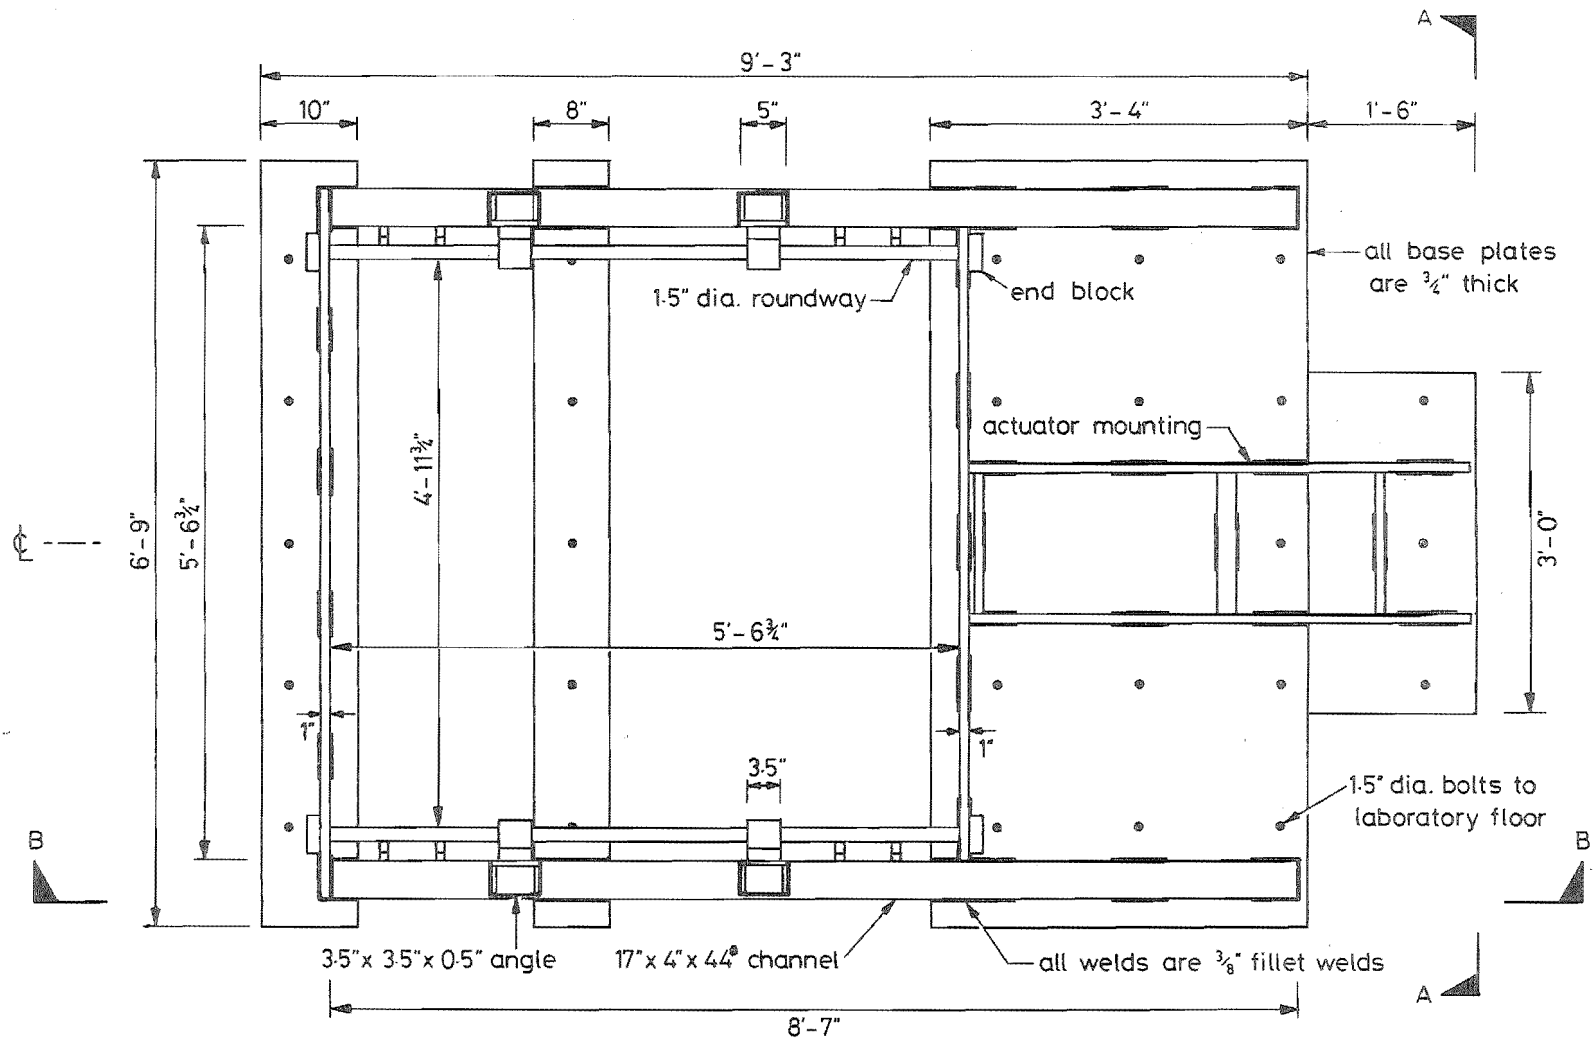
PLAN OF SHAKING TABLE FOUNDATIONS
